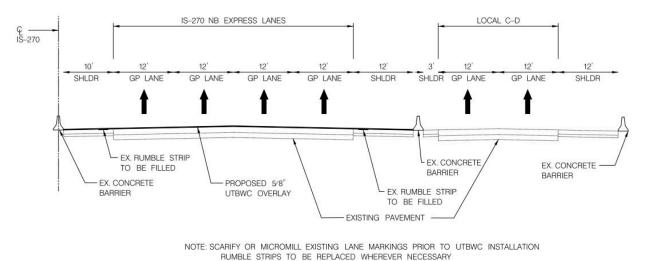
UTBWC Typical Section - Resurface Existing Shoulders
